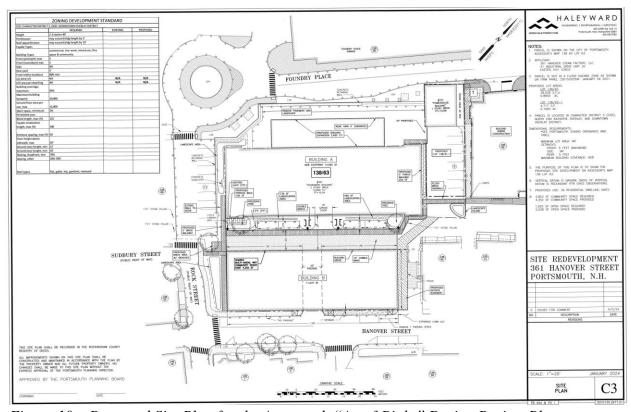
Proposed Site Plan for the Approved, "As-of-Right" Design Review Plan
